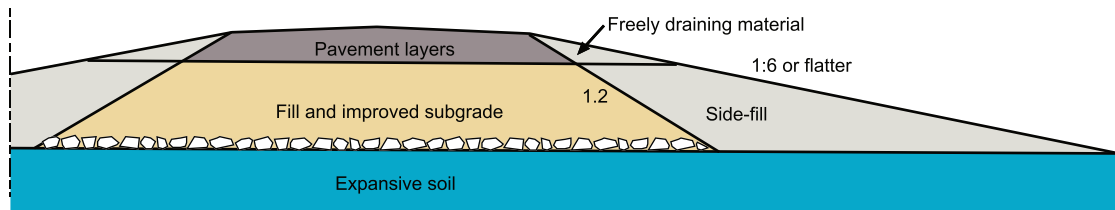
Construction on expansive soils (use of Pioneer layer)
